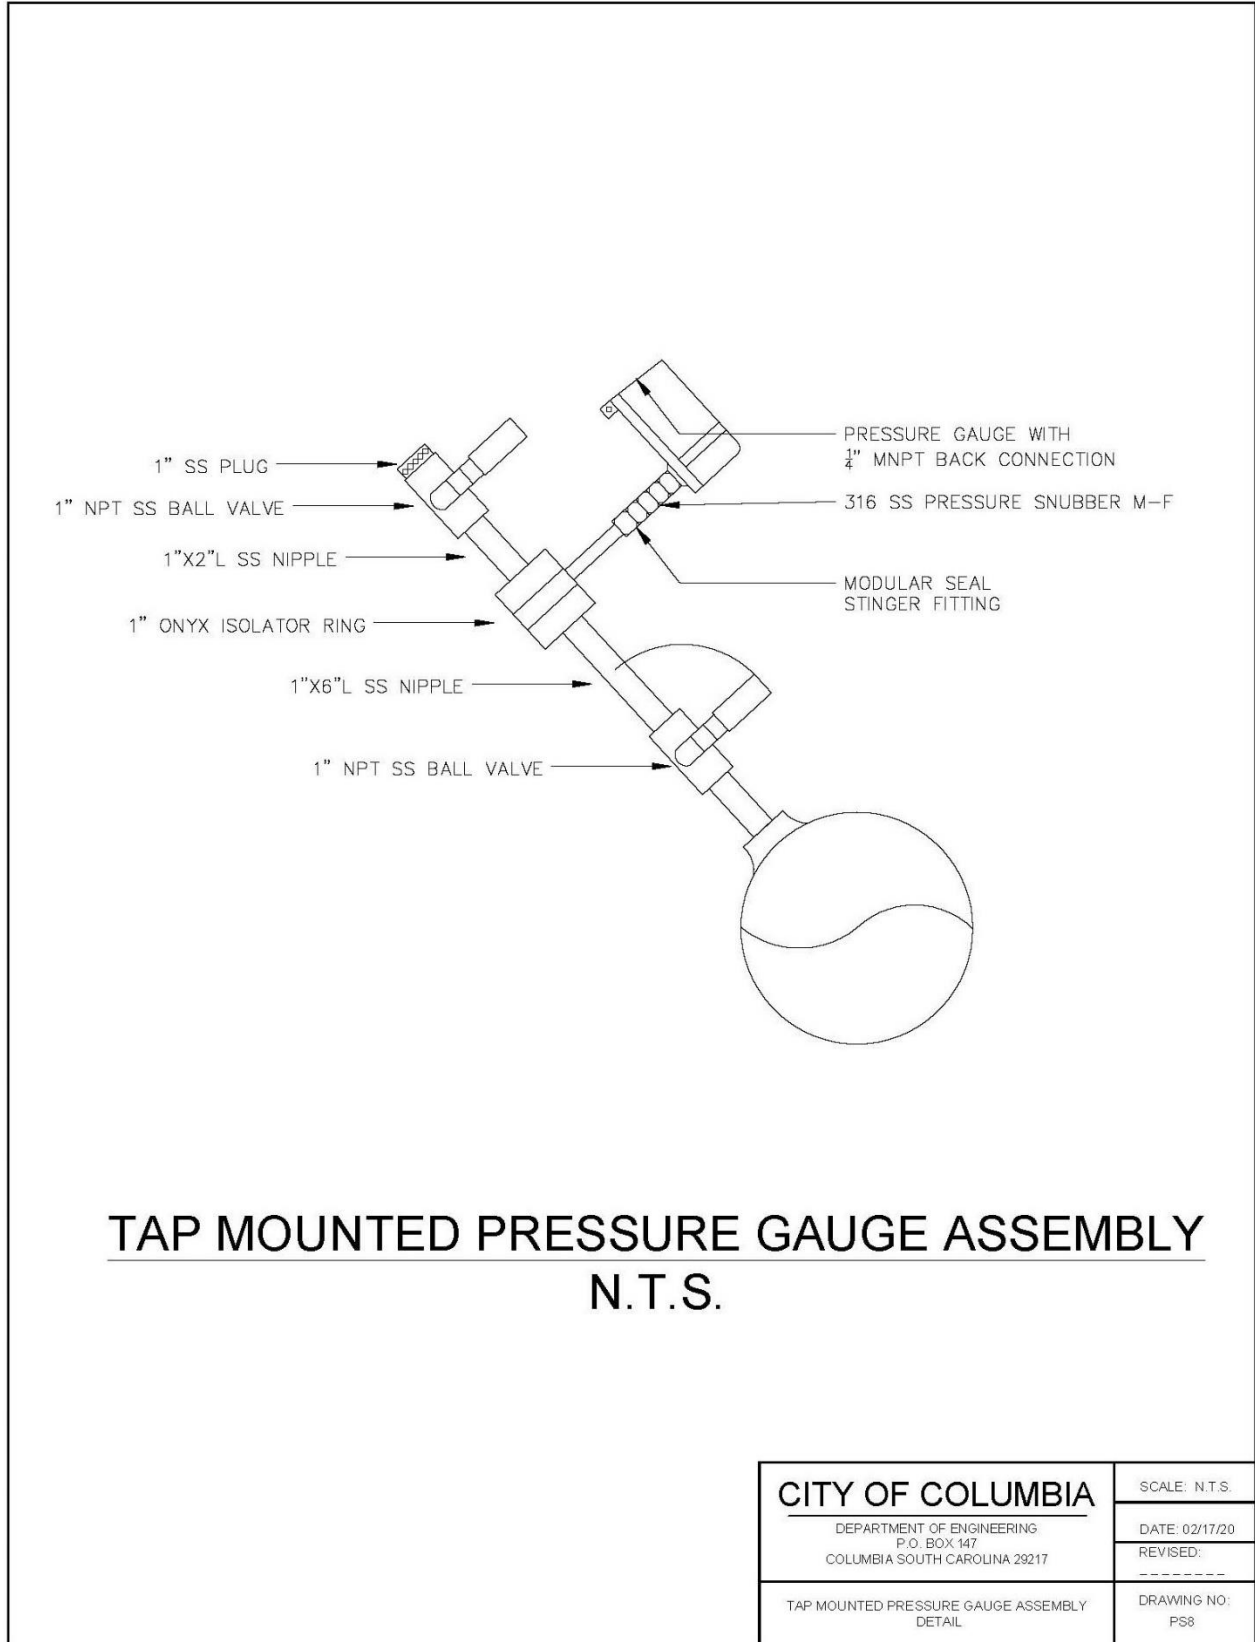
PS8 - Tap Mounted Pressure Gauge Assembly
